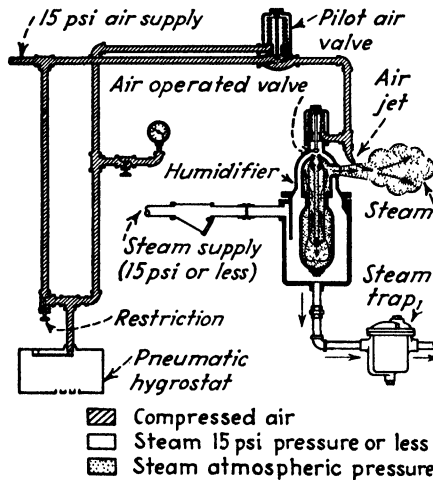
Device using steam to adjust humidity in a factory. (Courtesy of Armstrong Machine Works.)
